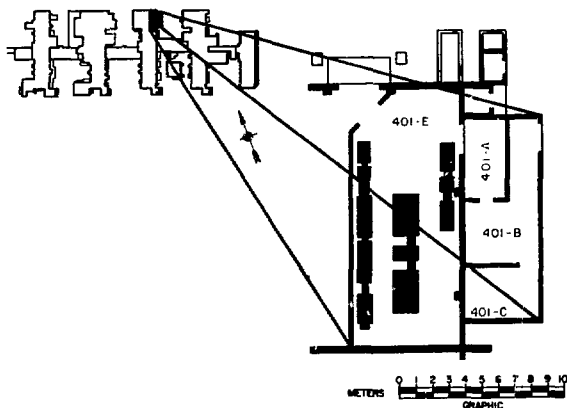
Floor plan of room 401-E and adjoining support rooms.
